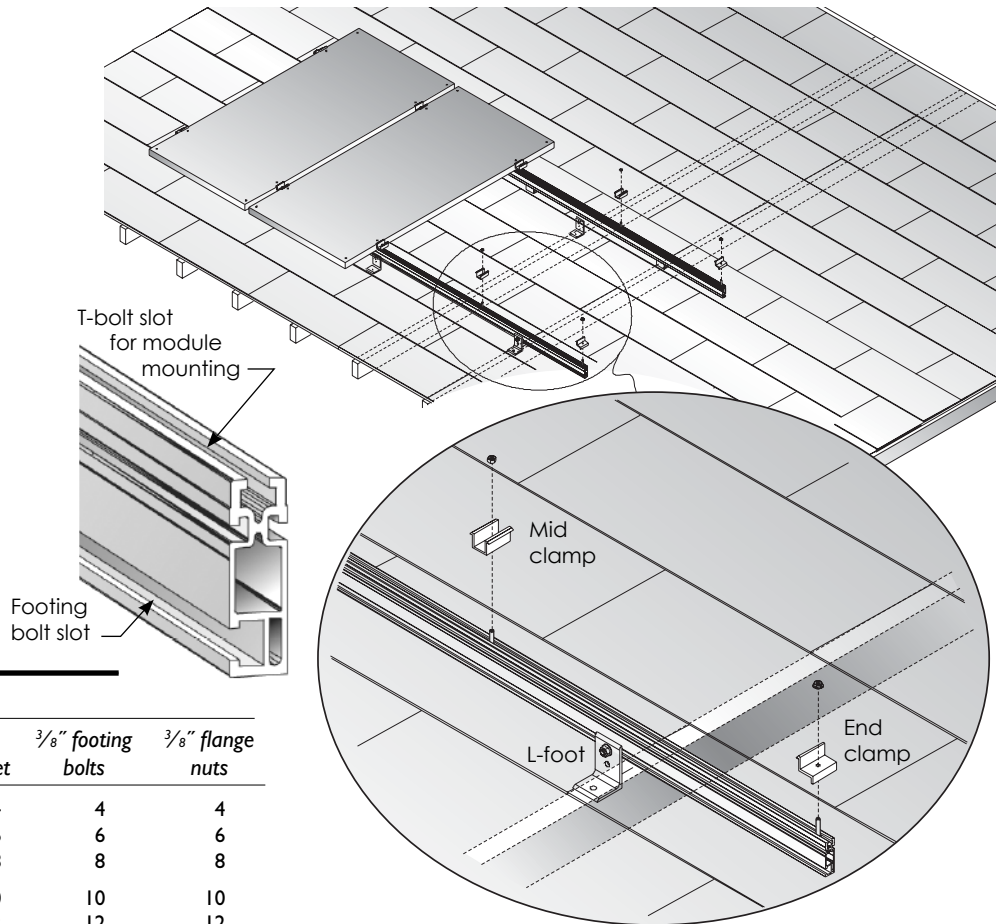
Exploded view of a low-profile installation mounted flush to the roof with L-feet.
